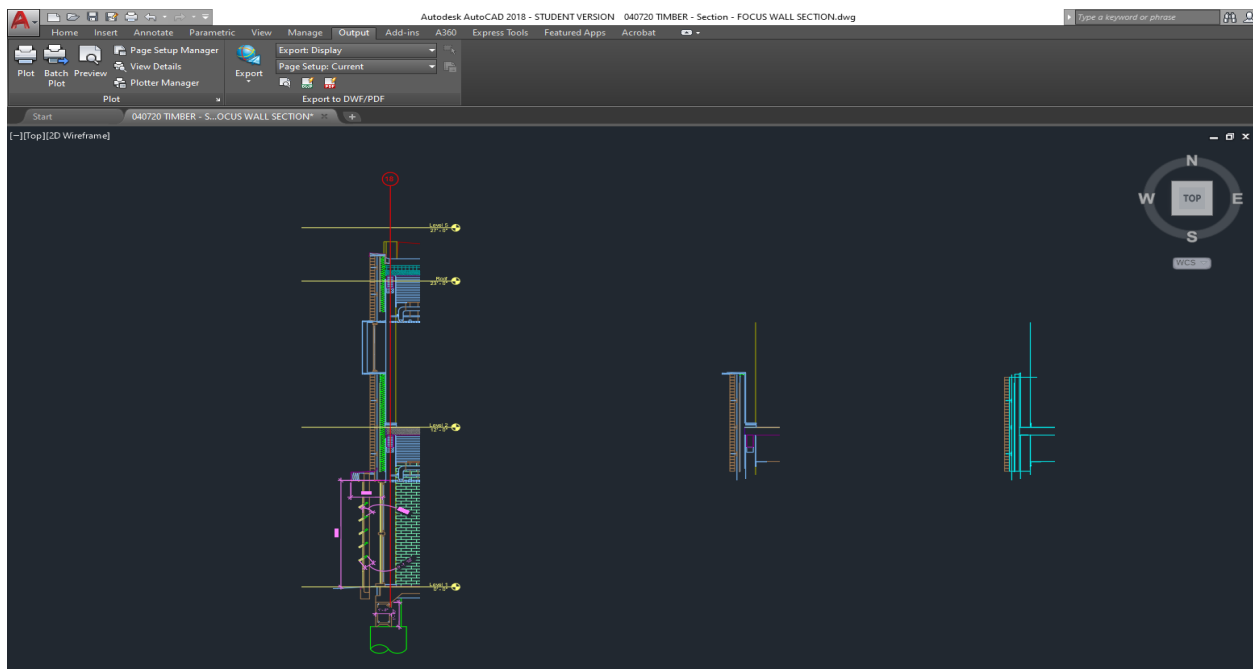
Simplifying Revit wall detail in AutoCAD to prepare for export to THERM
